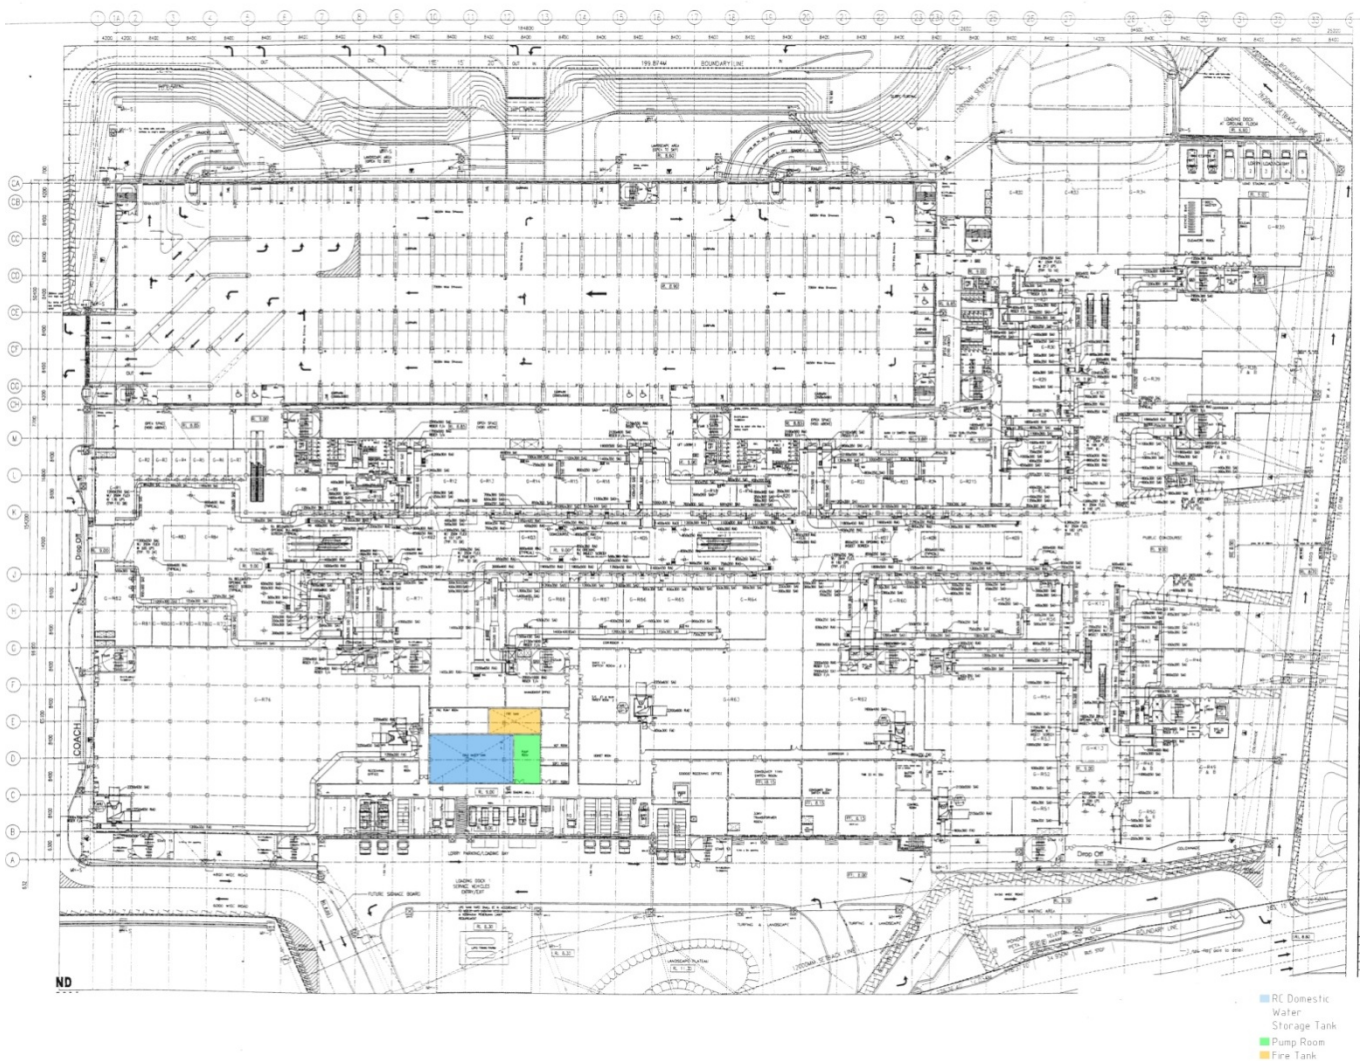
Location of RC Domestic Water Storage Tank, pump room and fire tank at Lower Ground Floor
